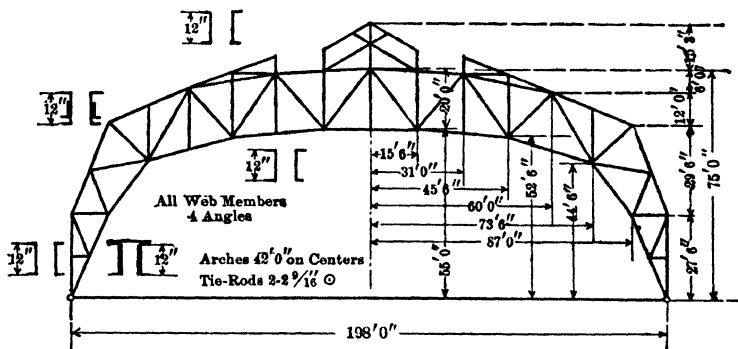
Two-hinged Arch, Chicago Live Stock Pavilion
